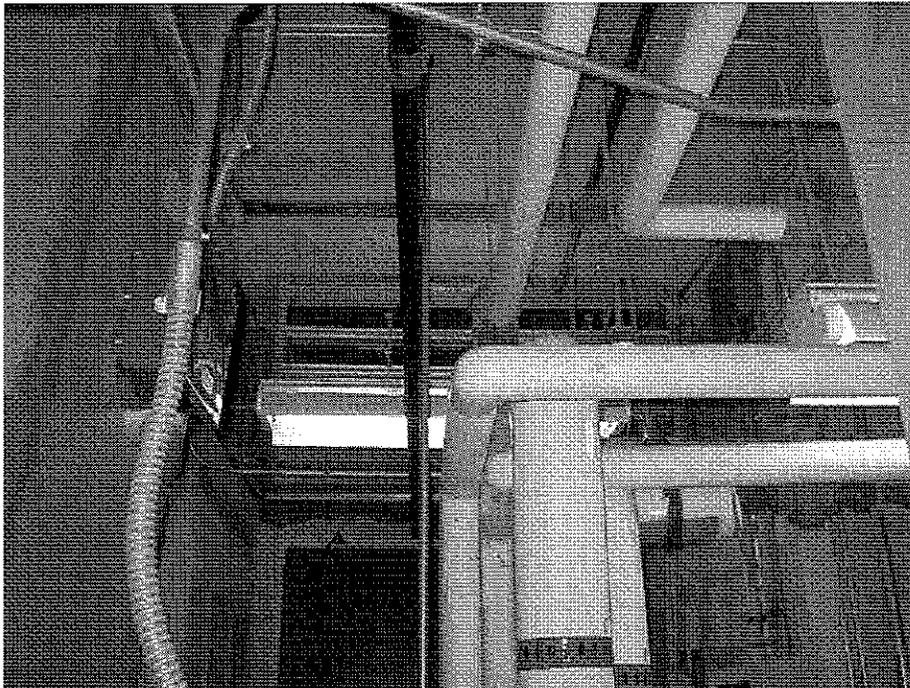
Photo of Typical Filter Installation in an Air Handling Unit (0109-0939\_IMG.JPG)
